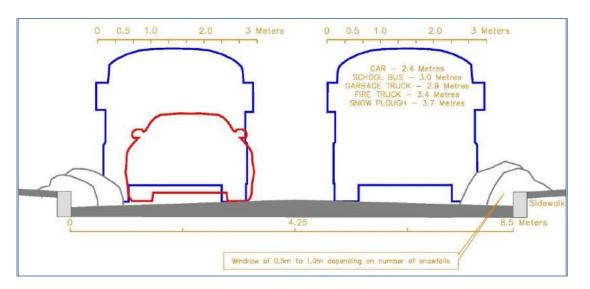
Factors which are Taken into Consideration when Defining the Preferred Road Width
